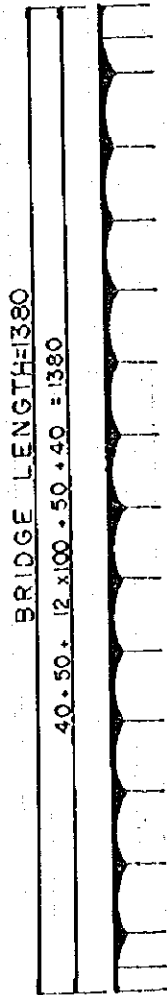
SPAN COMPOSITION BY CONCRETE BRIDGE TYPE (ROUTE-A)
